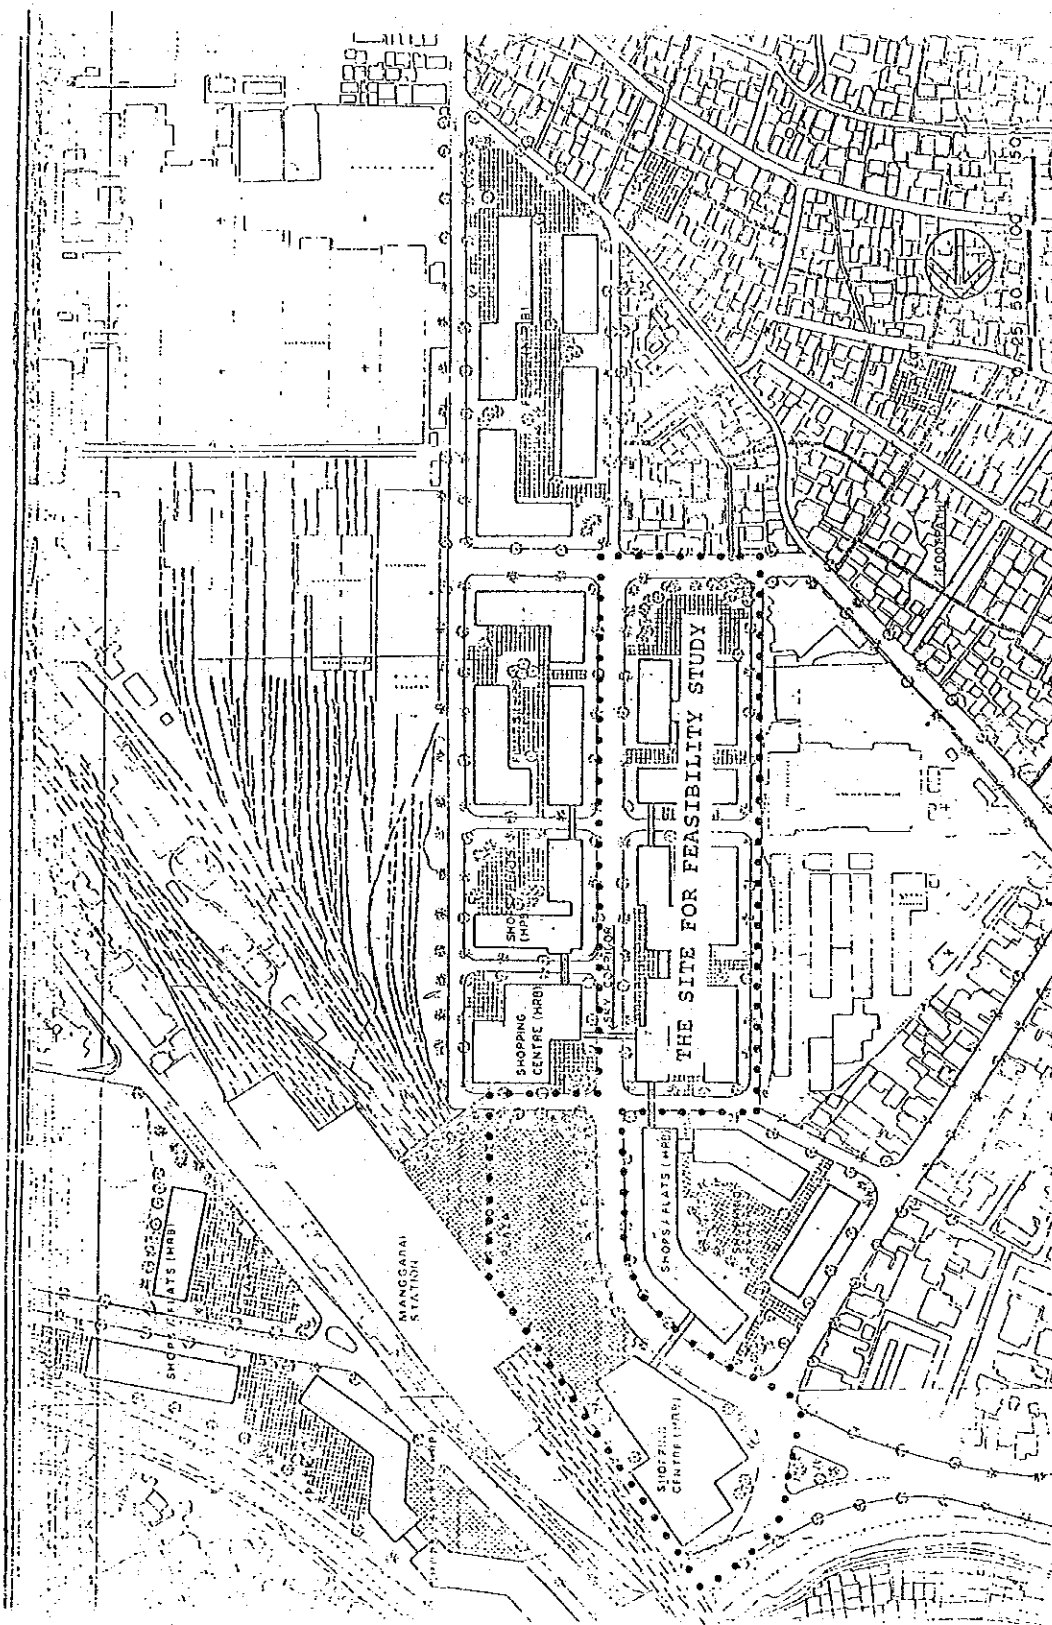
6 IMAGE PLAN "MANGGARAI"
